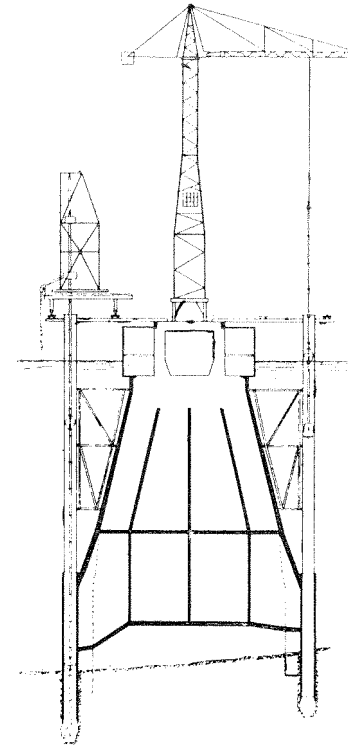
Bridge over the Lillebelt: Pier at Mid-stream during Construction.
